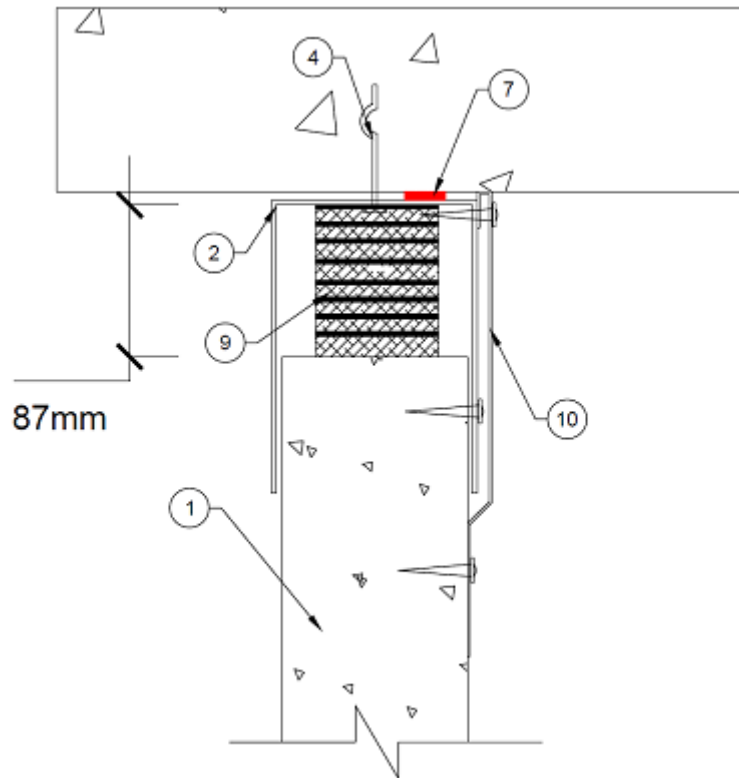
Head Detail 2 of the Wall with Maximum Gap Size
